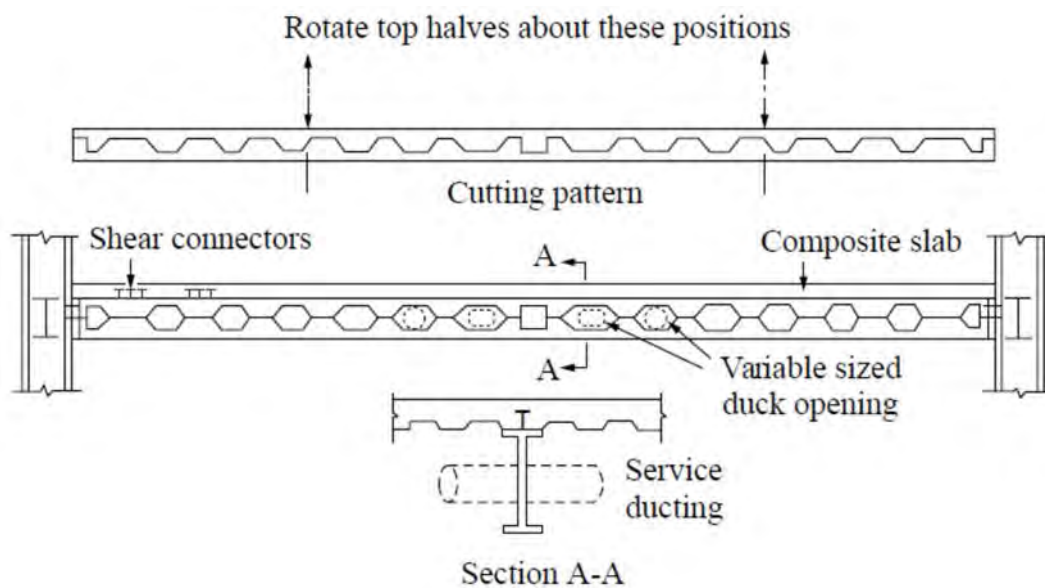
Composite castellated beam (Uy and Liew 2002).
